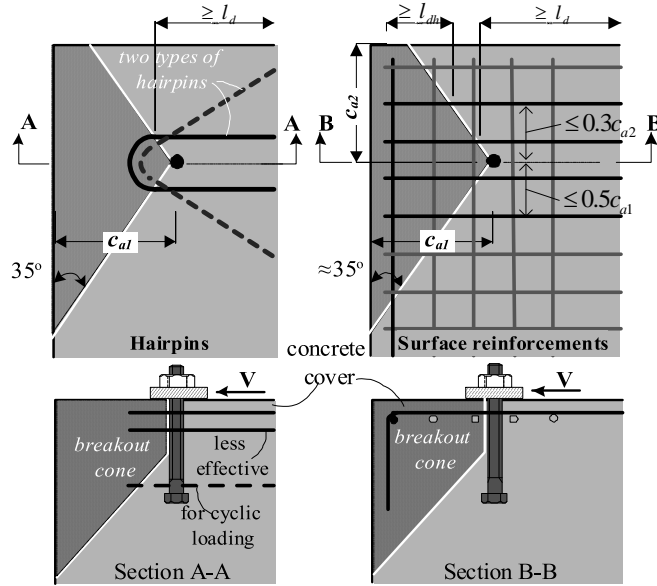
Schematics of existing anchor shear reinforcement (ACI 318-08)
